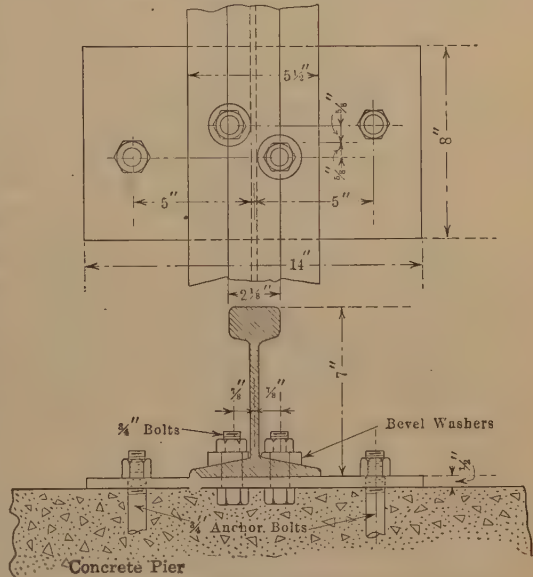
METHOD OF ATTACHING SHAFT RAILS TO PIERS.
